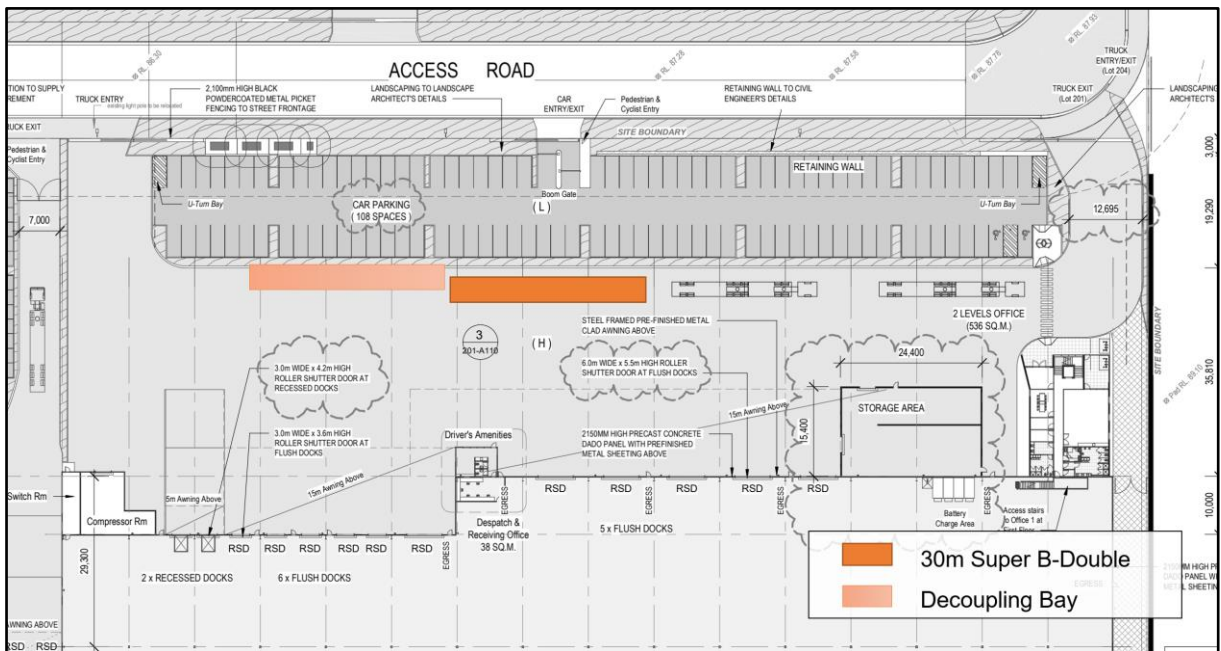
Warehouse 1 Loading Plan (30m Super B-Doubles)
